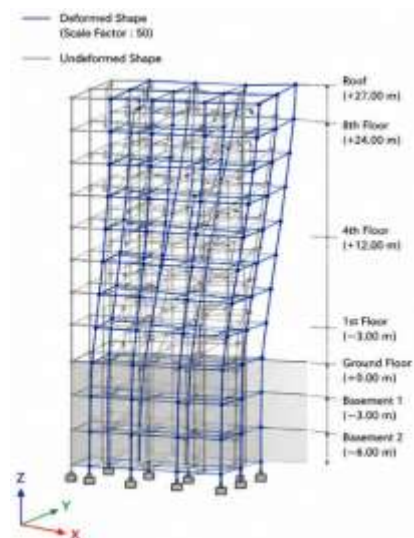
Overall deformed shape of G+8 RCC building under earthquake loading
